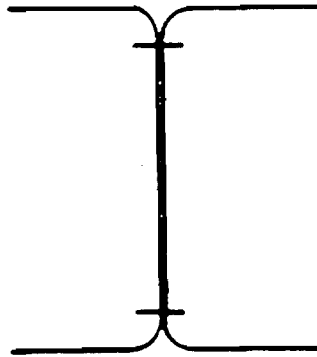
Configuration of Test Specimens for Members Having Unstiffened Compression Flanges
